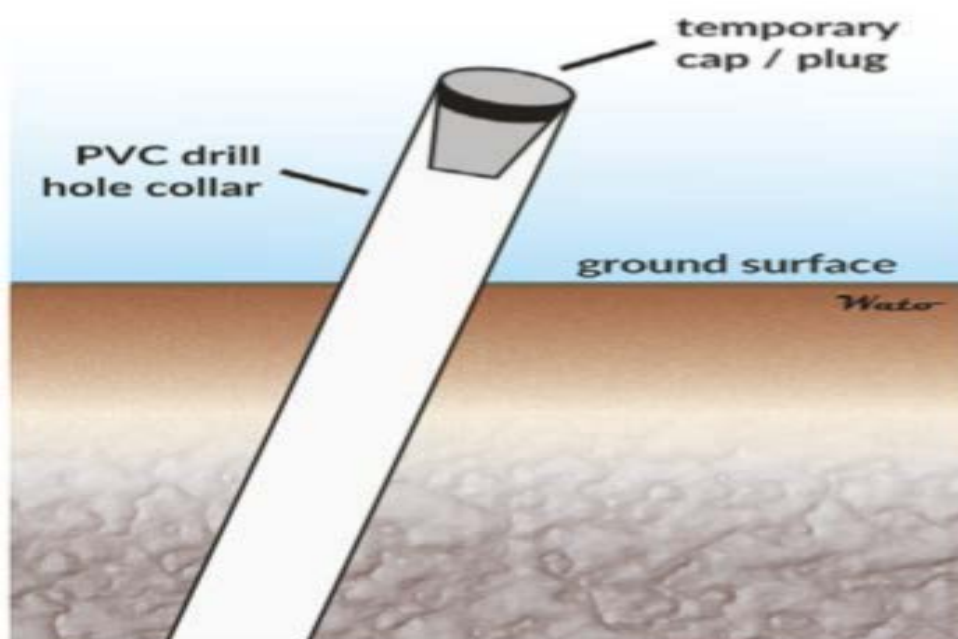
Showing the pvc drill hole collar of the same size “diameter & length” with the drill hole inserted.
